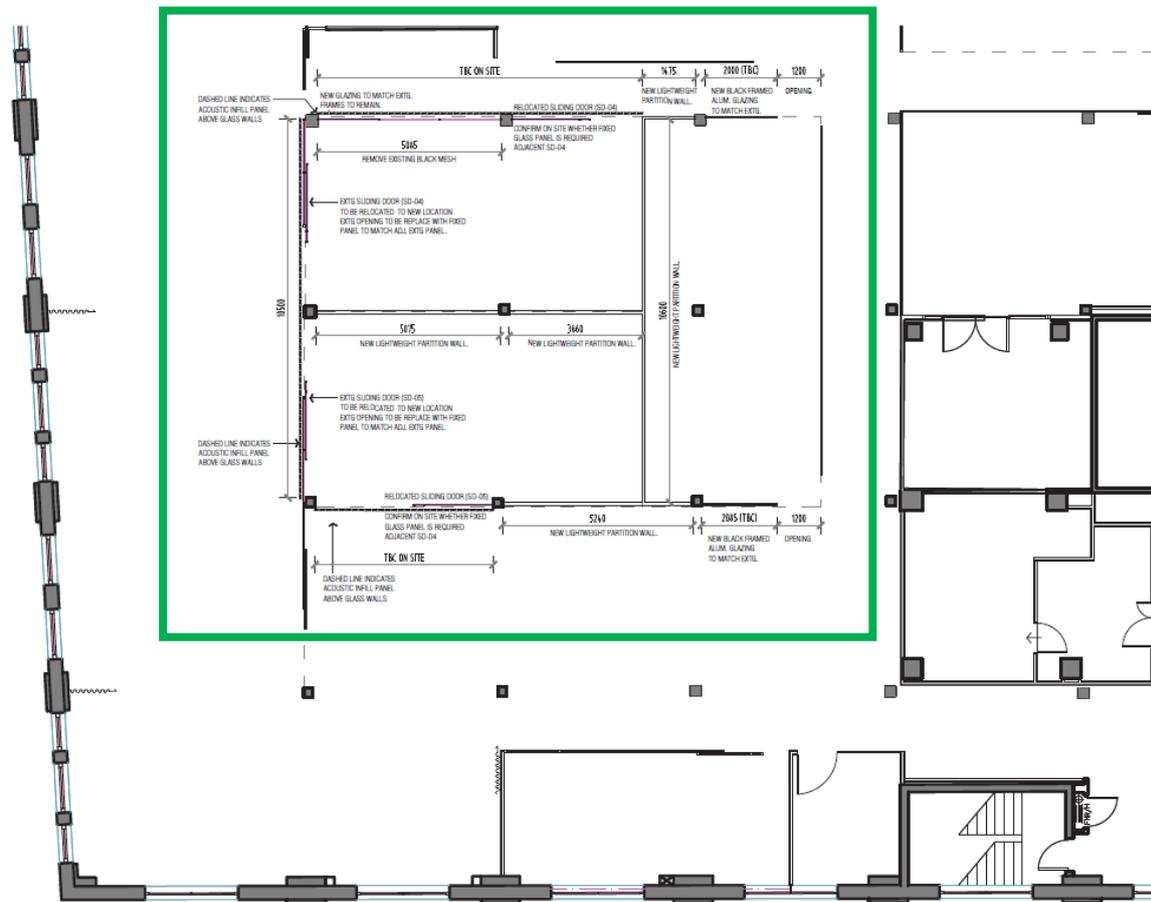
The proposed internal alterations to Level 1 (location of proposed works outlined in green)
